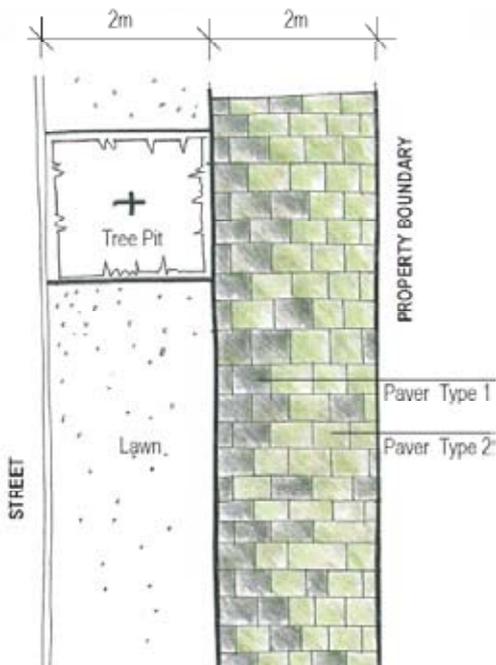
(d) – Footpath Paving – Residential Principal Street
